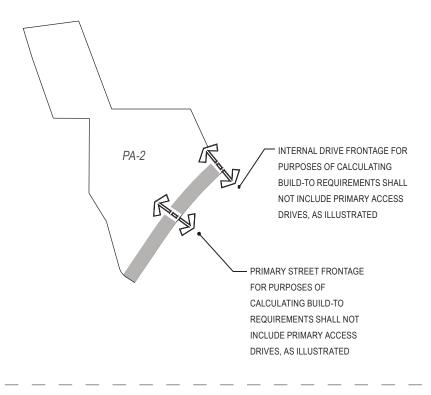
PLANNING AREA 2: NON-RESIDENTIAL USES BUILDING ORIENTATION AND SETBACKS ILLUSTRATION (NOT TO SCALE)
